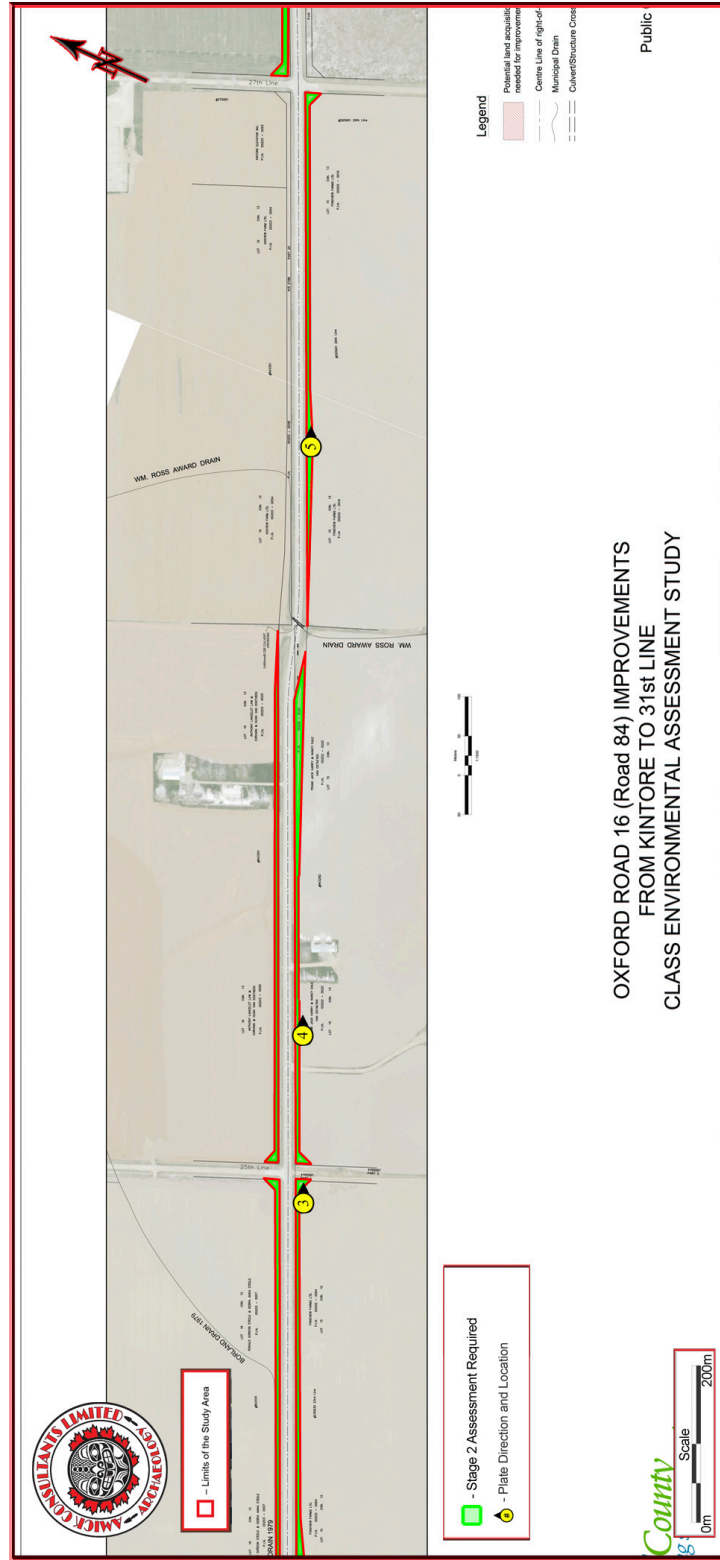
B DETAILED PLAN OF COUNTY ROAD 16
